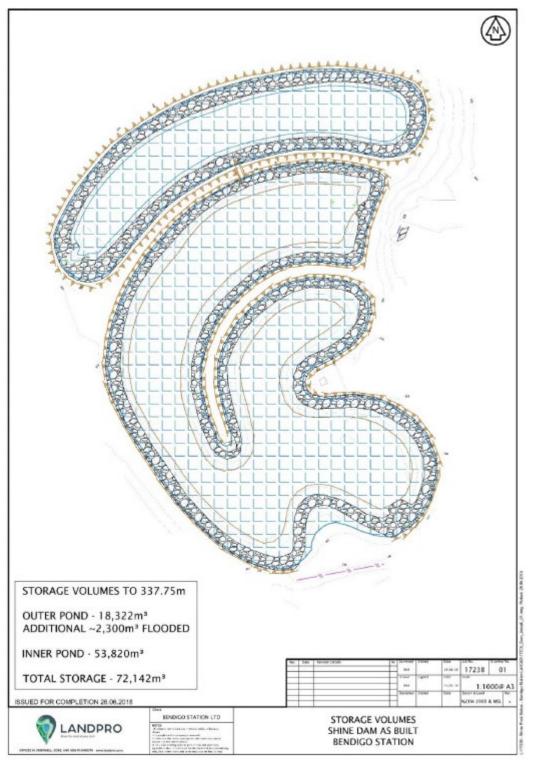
As built engineering drawing of two reservoirs. Source: Application.
